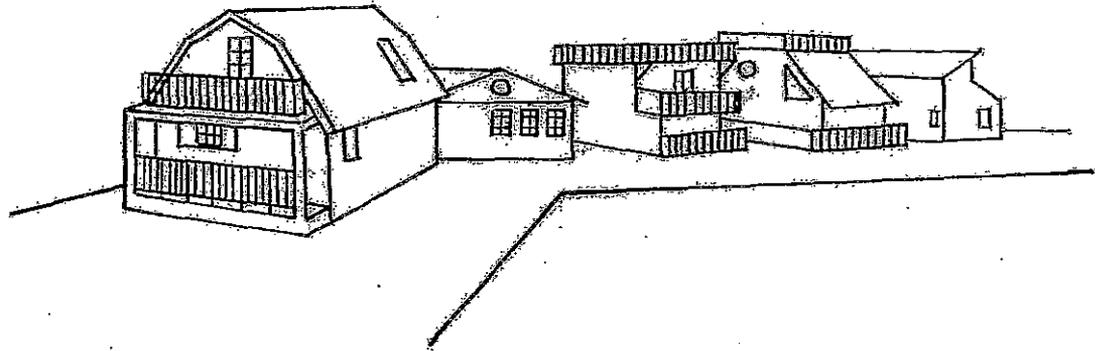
COMMERCIAL ROOF LINES AND FACADES
